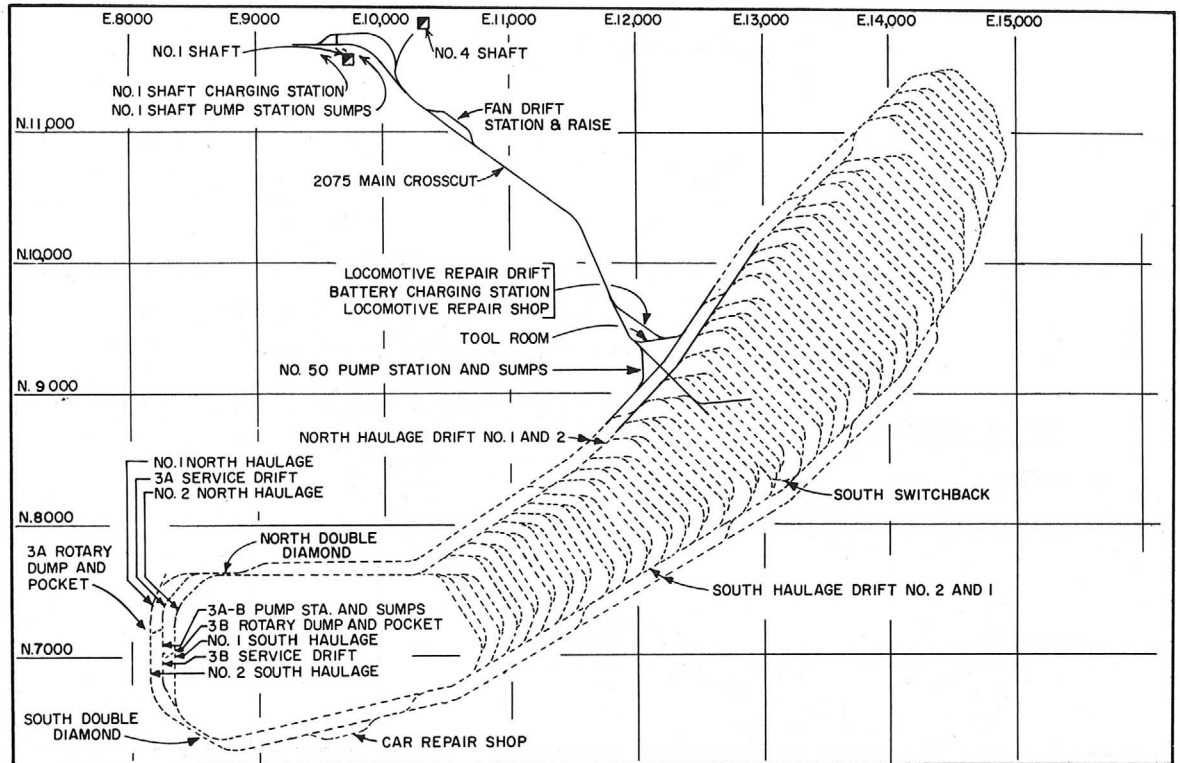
Proposed Development of the 2075 Haulage Level.
